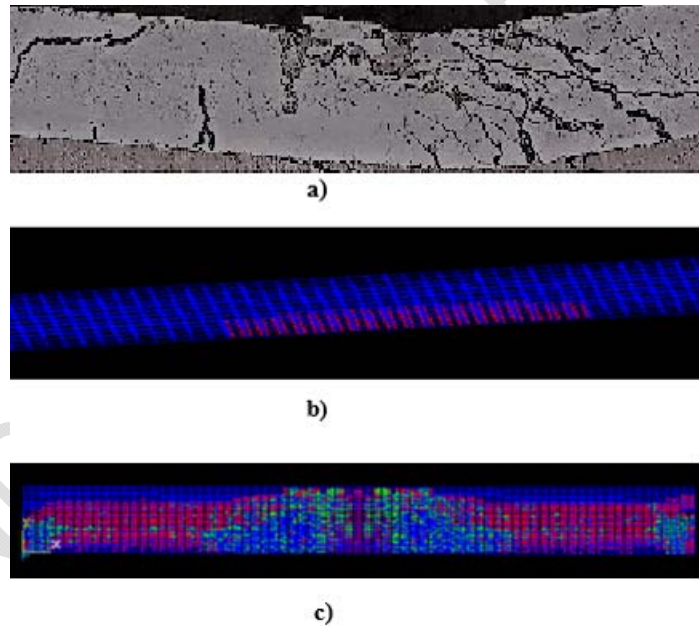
Crack pattern for box beams; a) Experimental crack pattern; b) NLFE crack pattern; c) NLFE cracks till failure.
